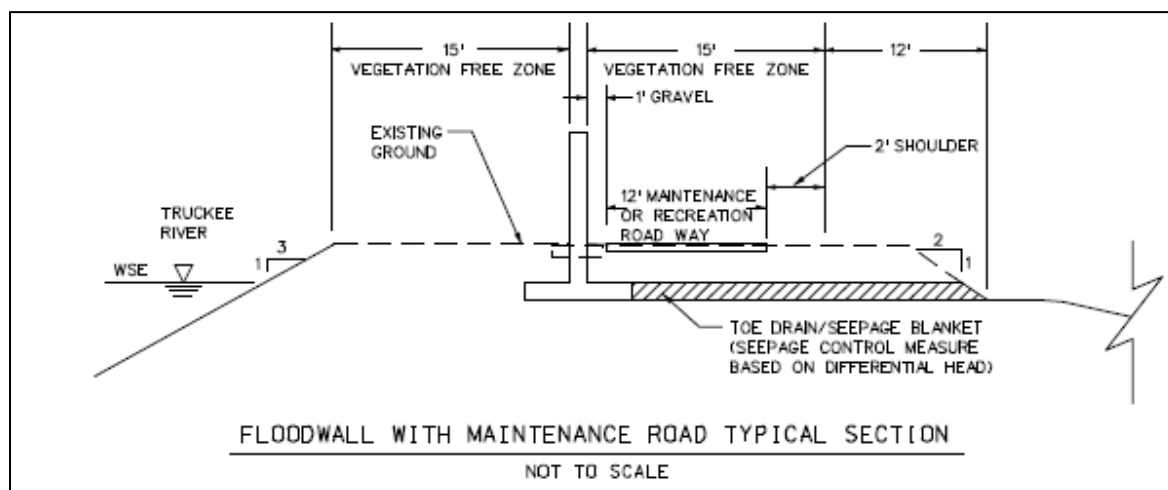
Typical drawing of on-bank floodwall cross-section.
